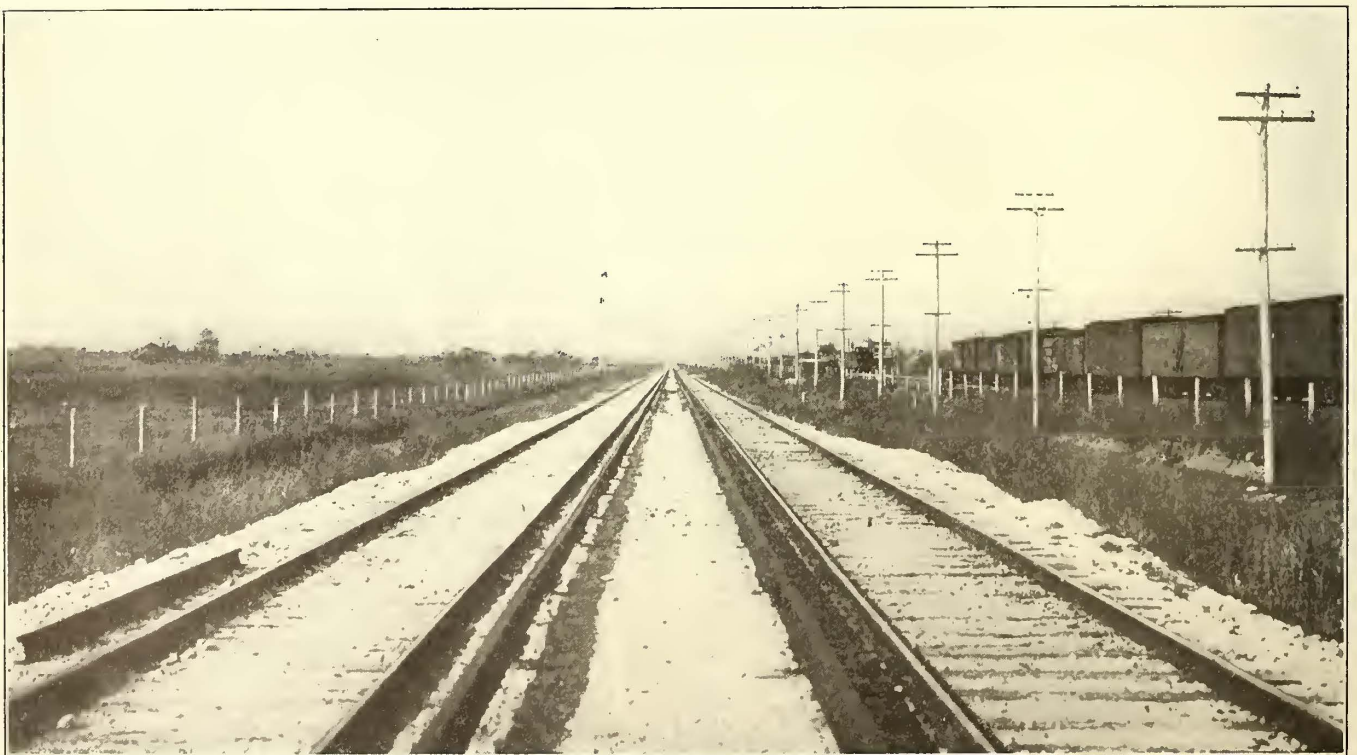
Aurora, Elgin & Chicago—Double-Track Third-Rail Roadbed, with Stone Ballast
